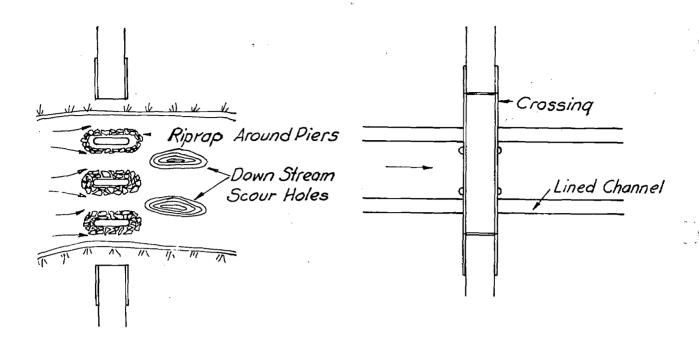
Loose riprap. Loose rock riprap piled around piers to prevent local scour at the pier may cause deep scour holes to form downstream.
